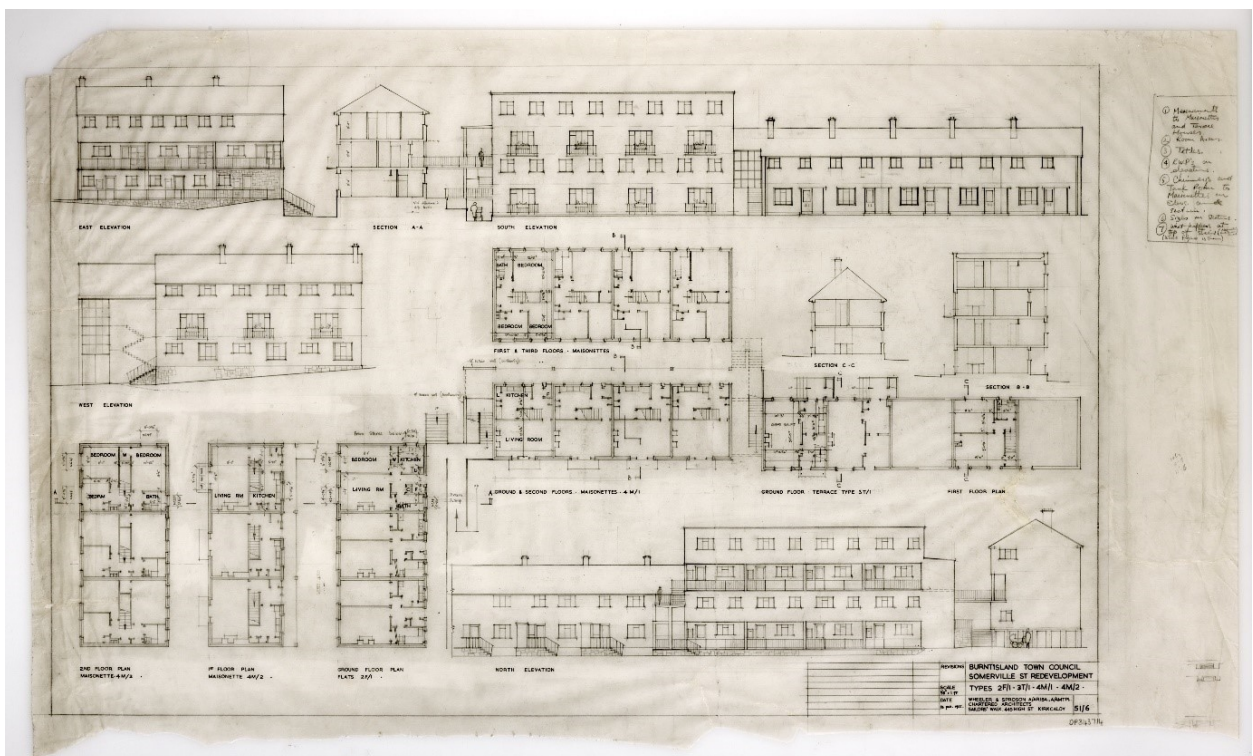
Elevations of the Somerville Square 'B2' blocks of the Somerville Street/ High Street Development (Job 51), 26 February 1955.
